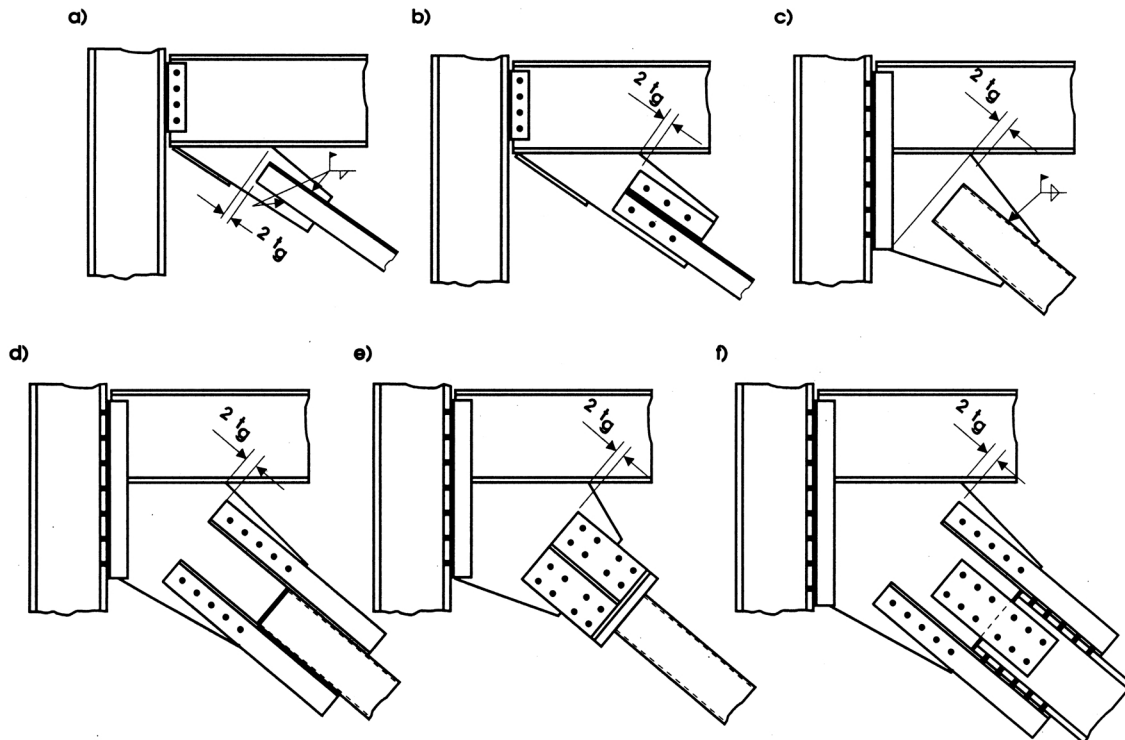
Connection detail allowing rotation of the brace ends upon out-of-plane buckling (adapted from Astaneh-Asl et al. (1985)).
